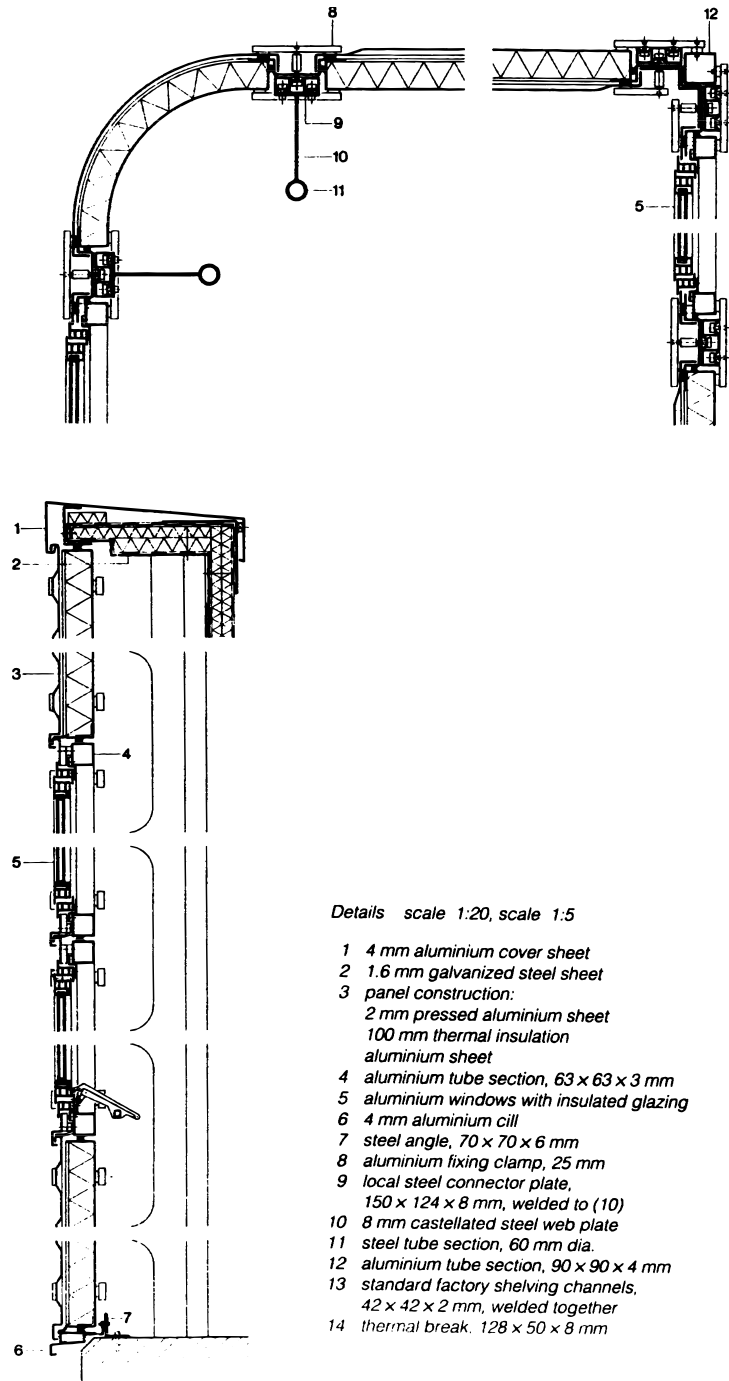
Cladding details, top: horizontal section, bottom: vertical section.
